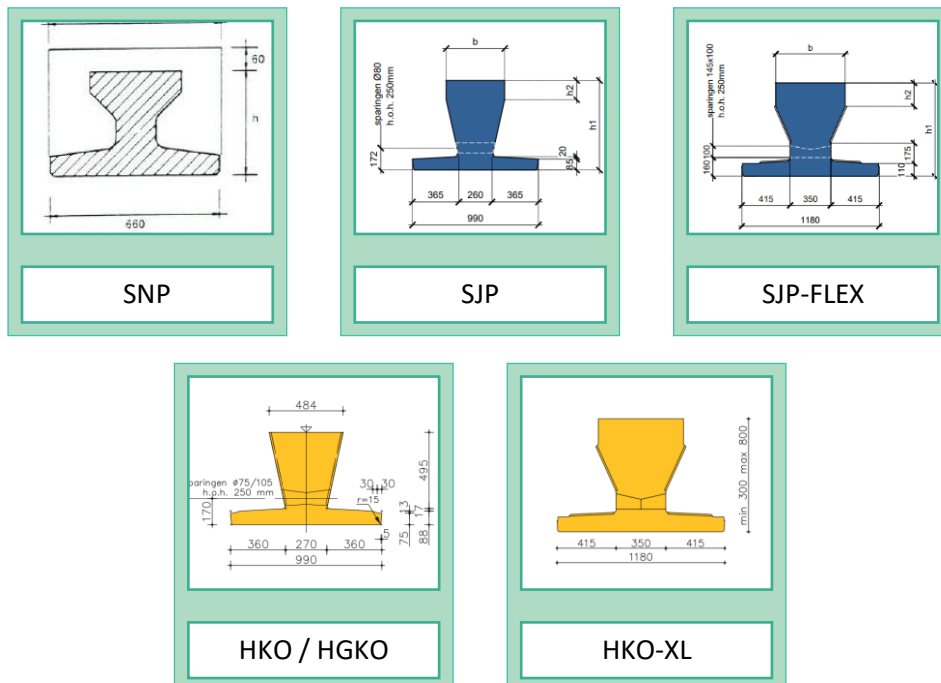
Cross sections of different infilled girders (Spanbeton, n.d.-c; Haitsma beton, n.d.-a; Ergon, n.d.)
